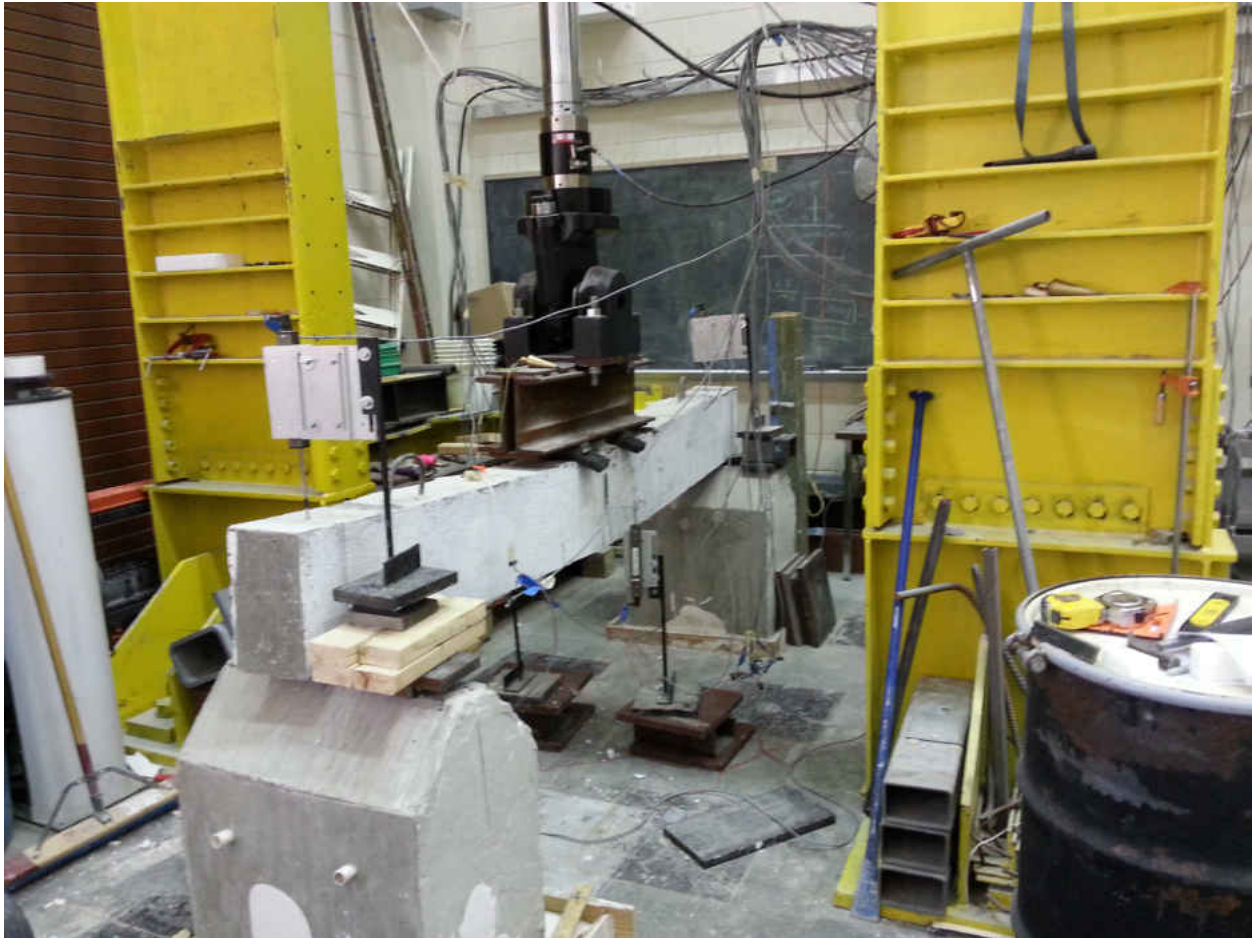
Large Scale Girder Test Setup for Retrofitting with FRP
